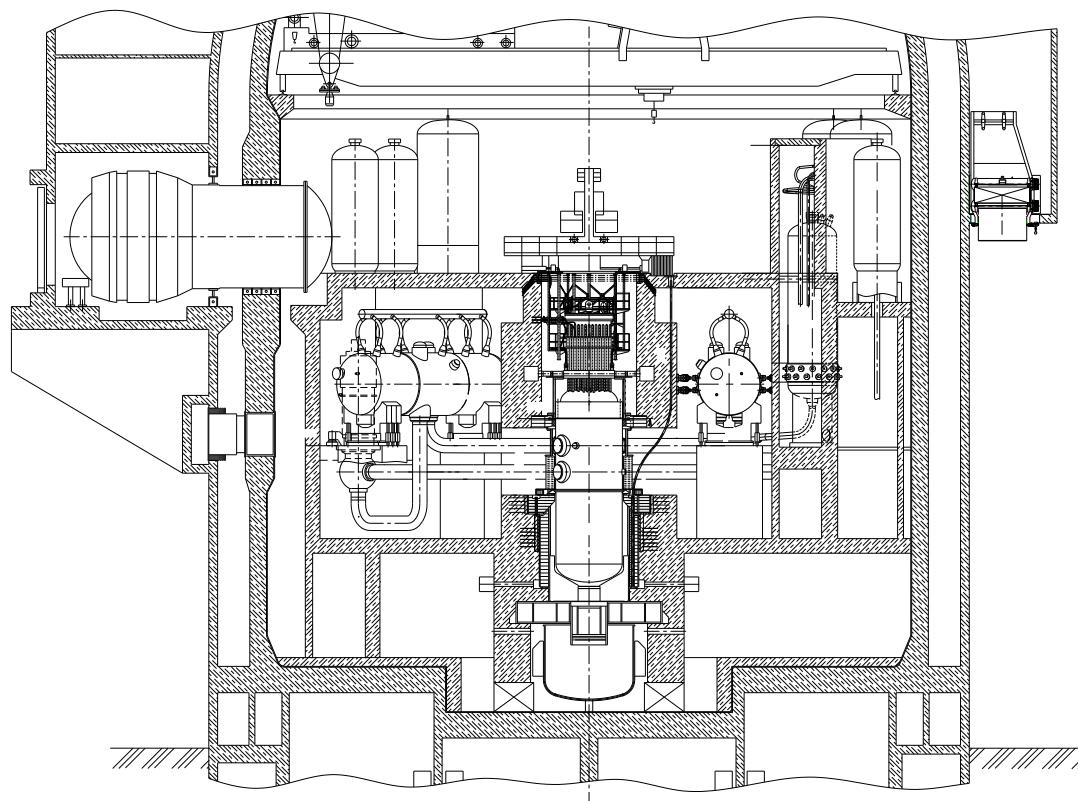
Example of arrangement of WWER equipment in the reactor building.
